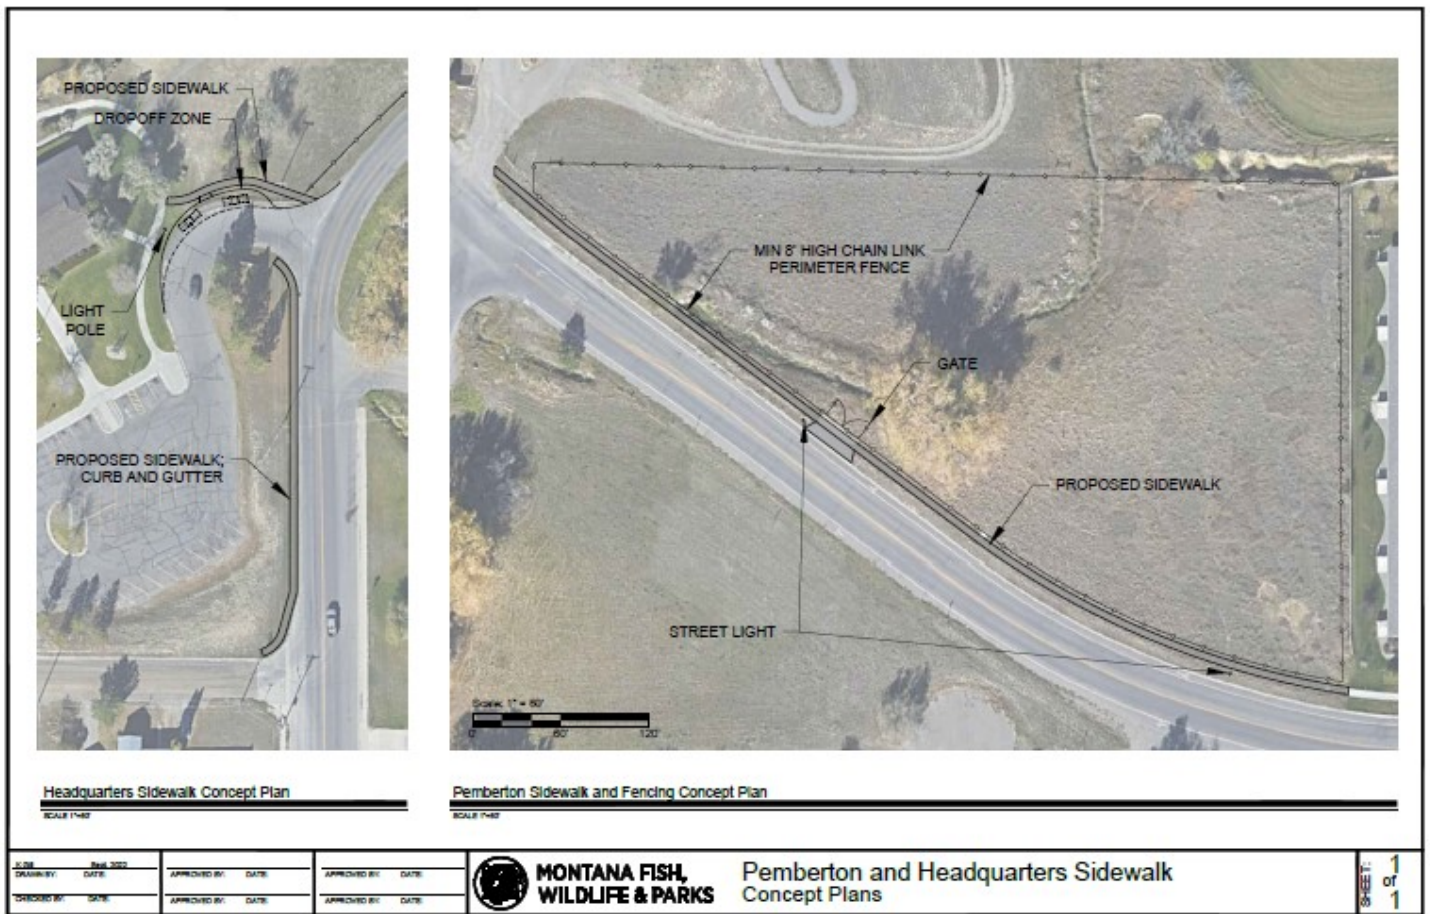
Concept plans for Headquarter sidewalk and unloading and loading parking area, and Pemberton sidewalk, lighting, and security fence.
